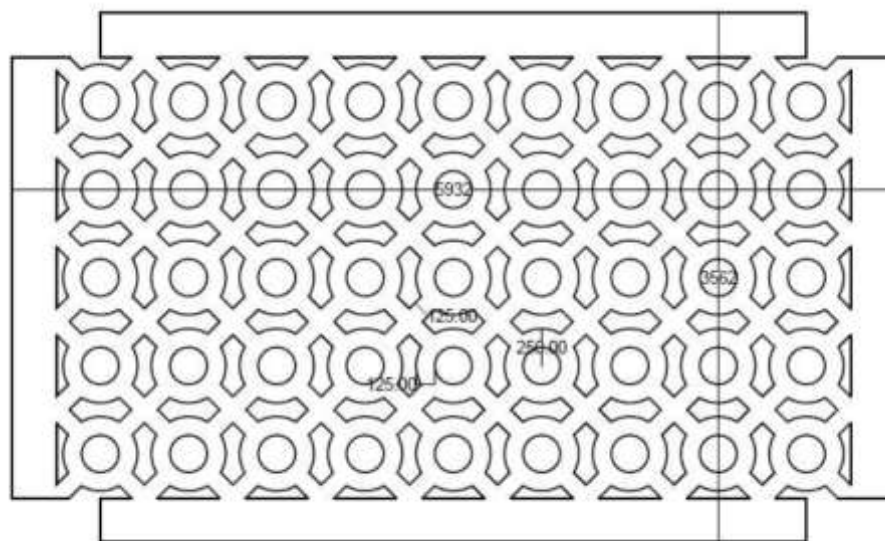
A view of the dimensions of the C5 ring-shaped steel plate shear wall
